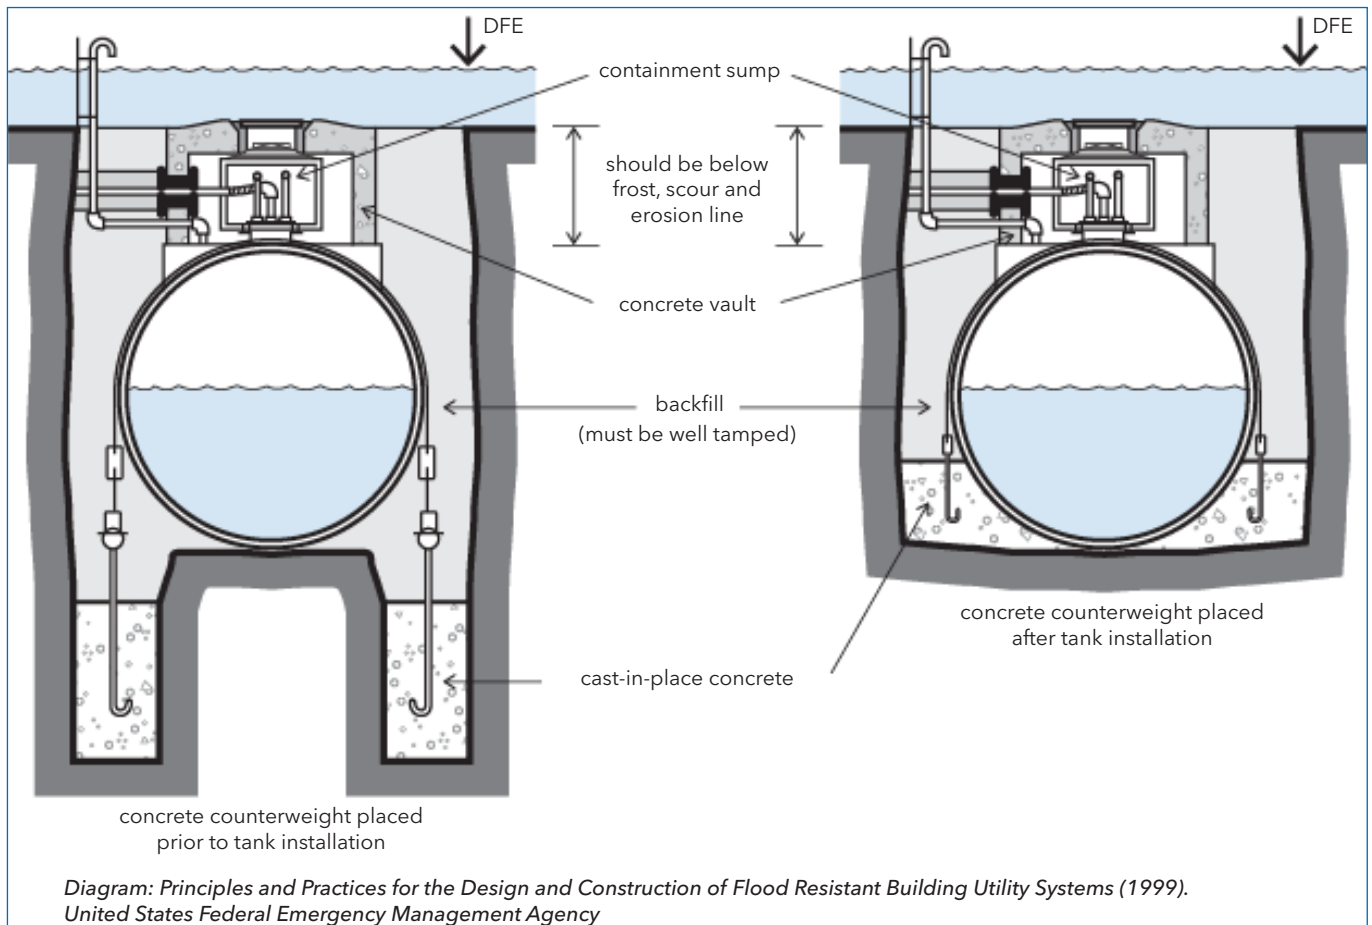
Securing a tank to an anchor belt embedded in a concrete counterweight
